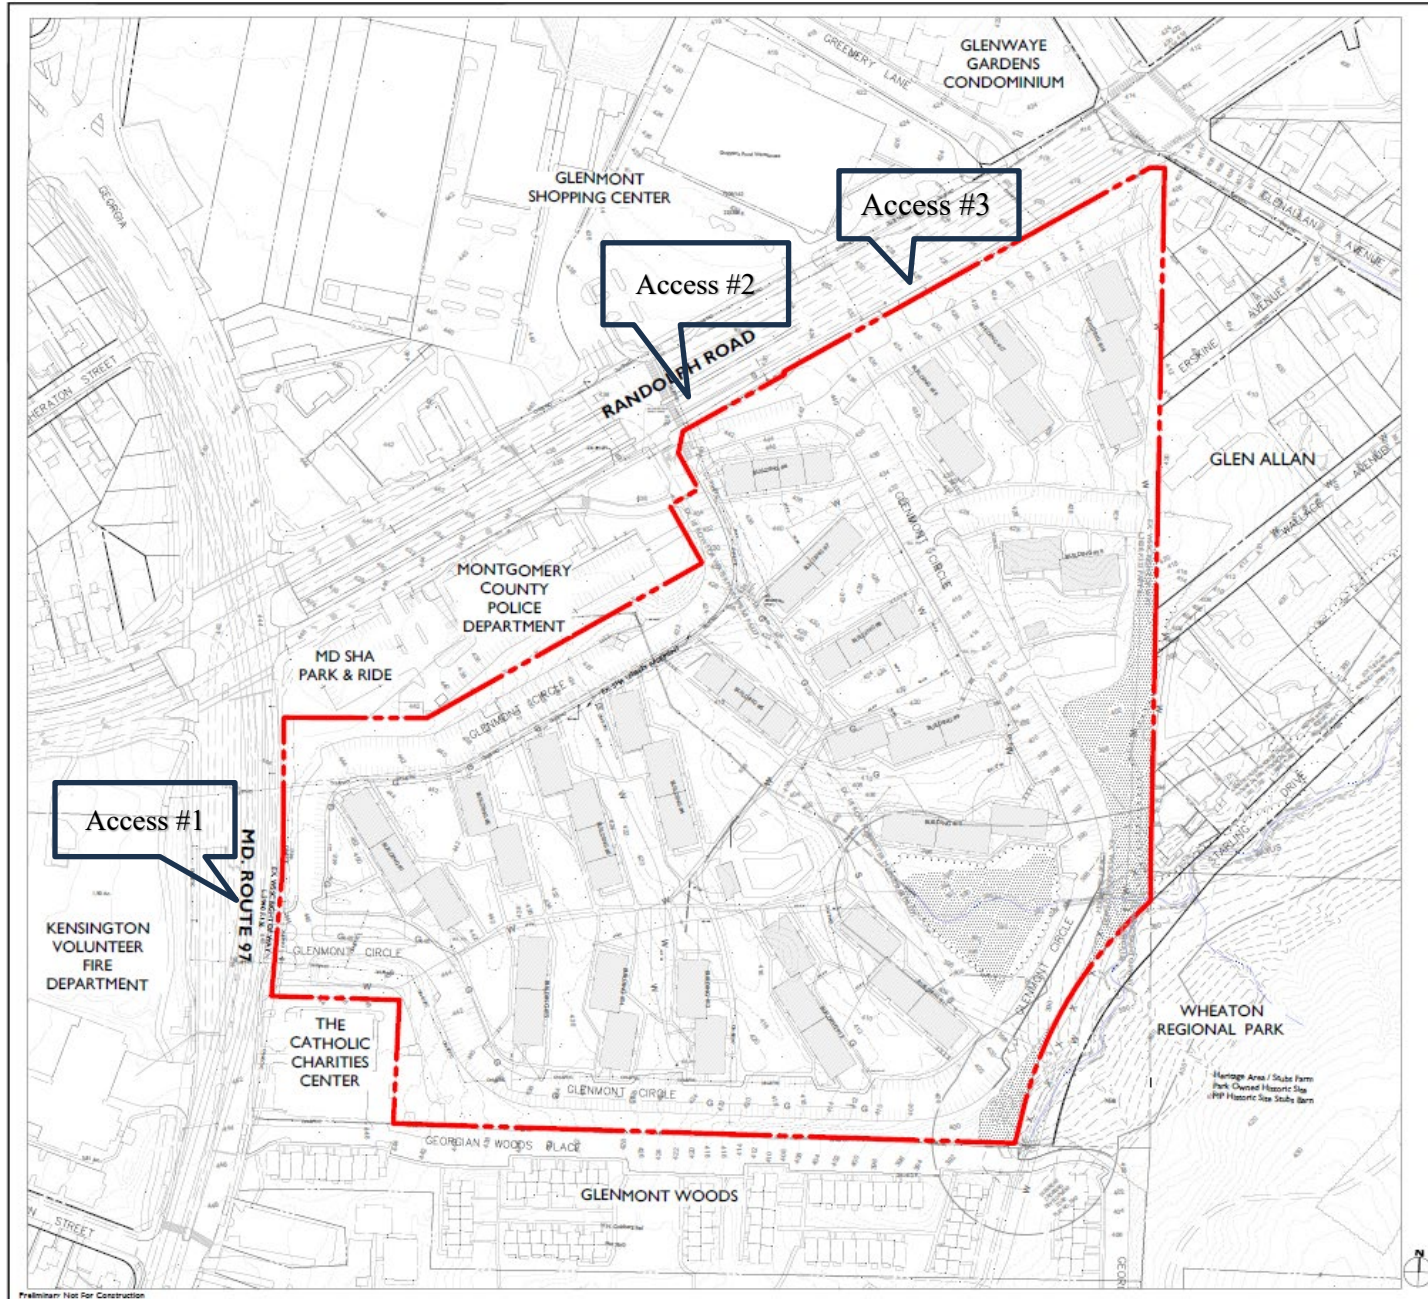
Existing Conditions Site Plan – Access points noted
